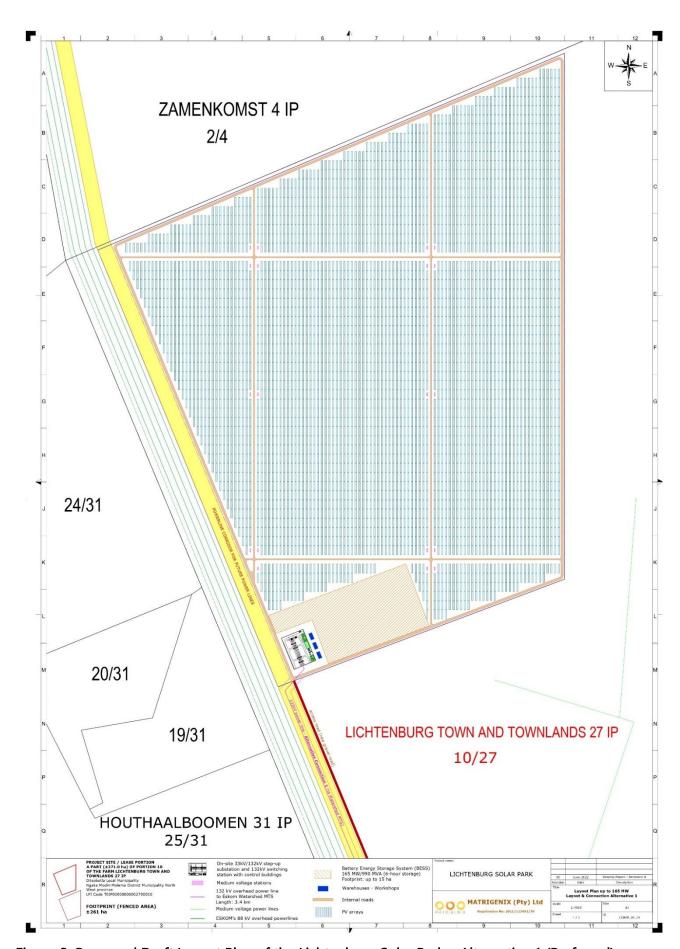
Proposed Draft Layout Plan of the Lichtenburg Solar Park – Alternative 1 (Preferred)
